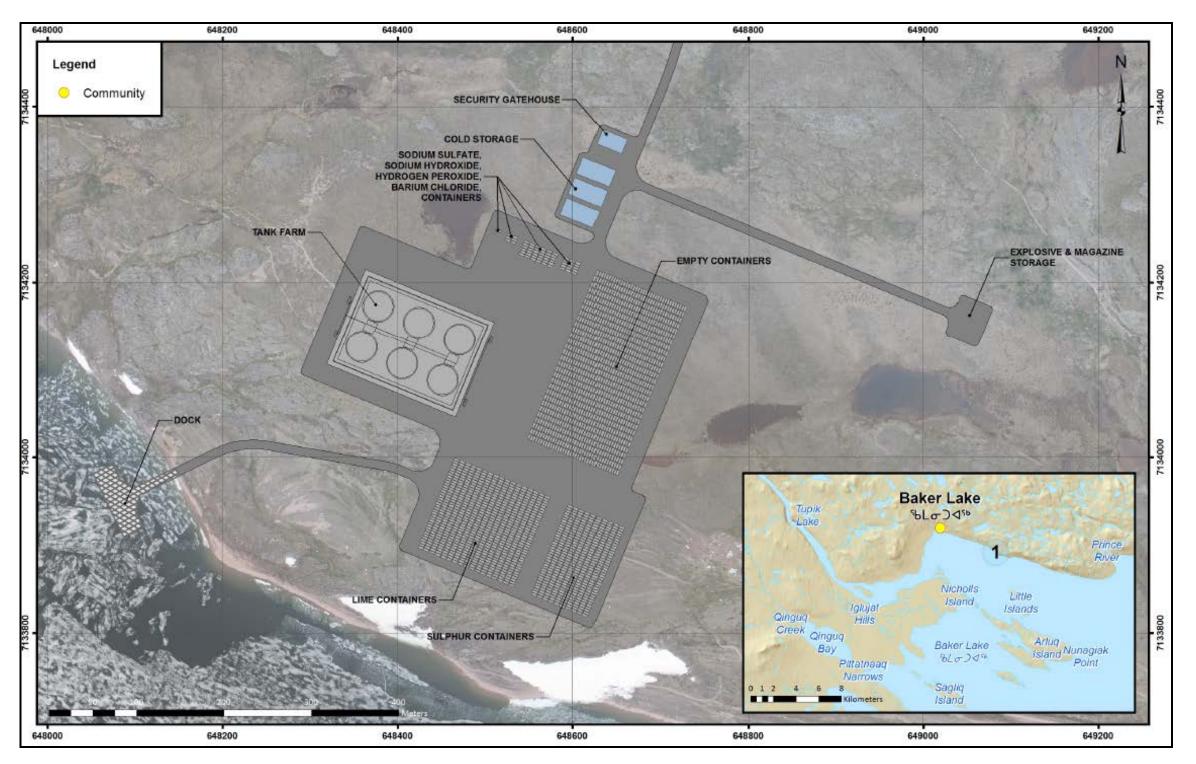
Baker Lake Dock and Storage Facility Layout
